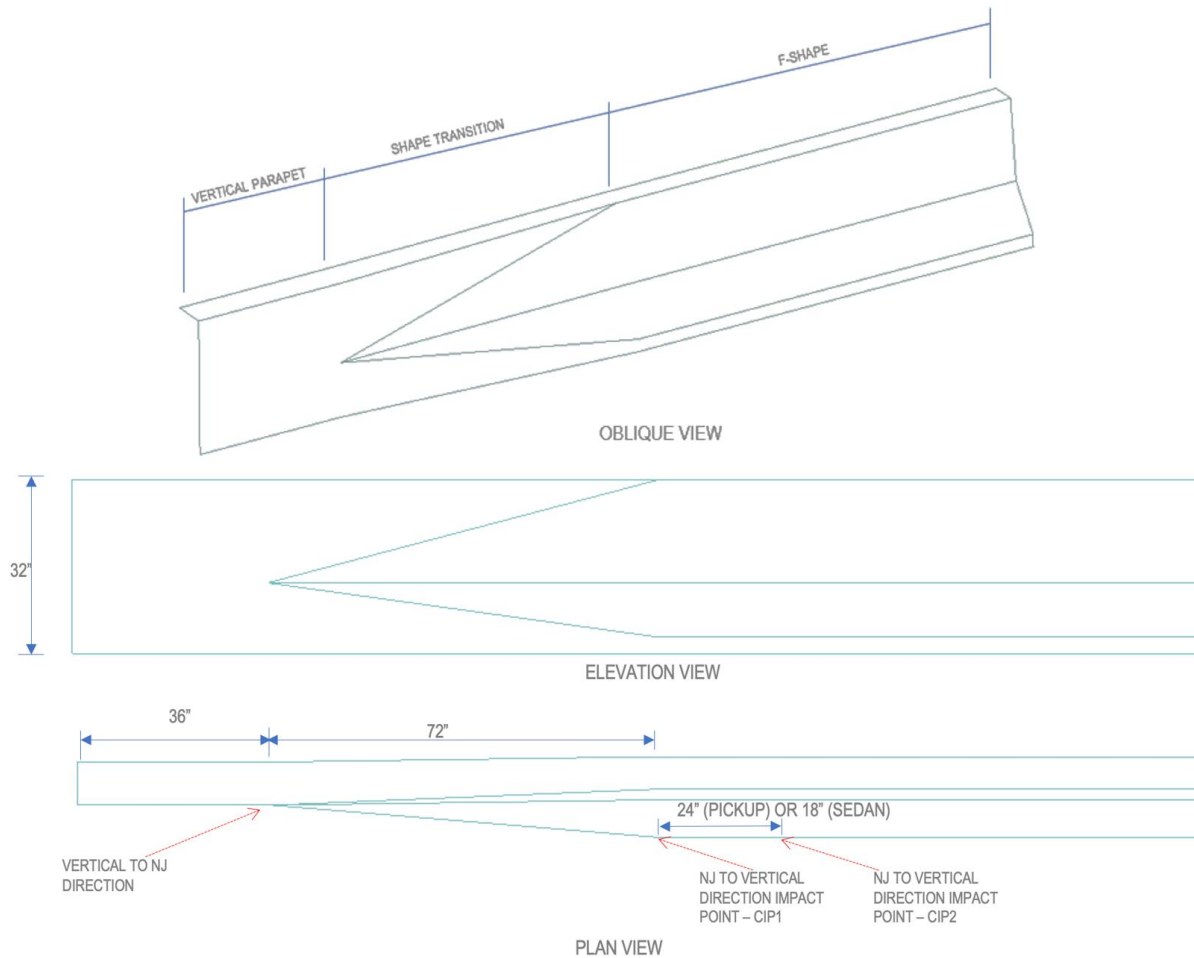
Vertical to NJ Barrier Shape Transition Design and Impact Points.
